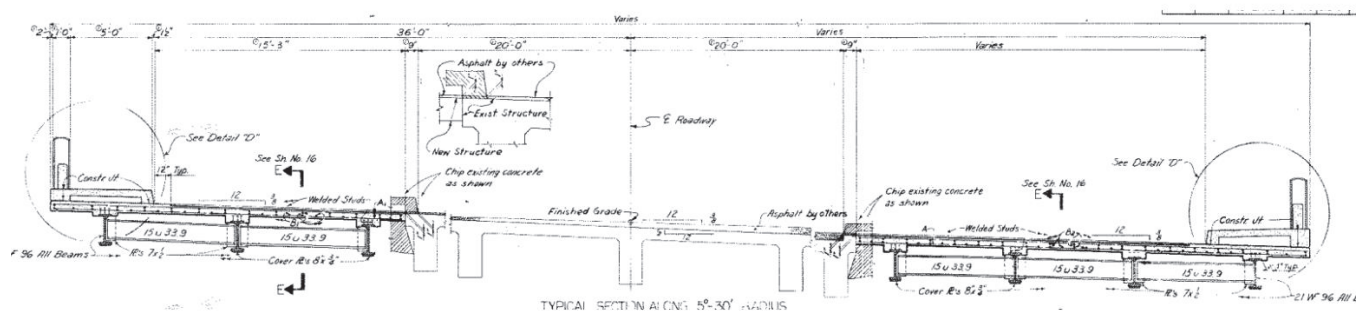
RC Tee-Beam Bridge with Steel Girder Widening
